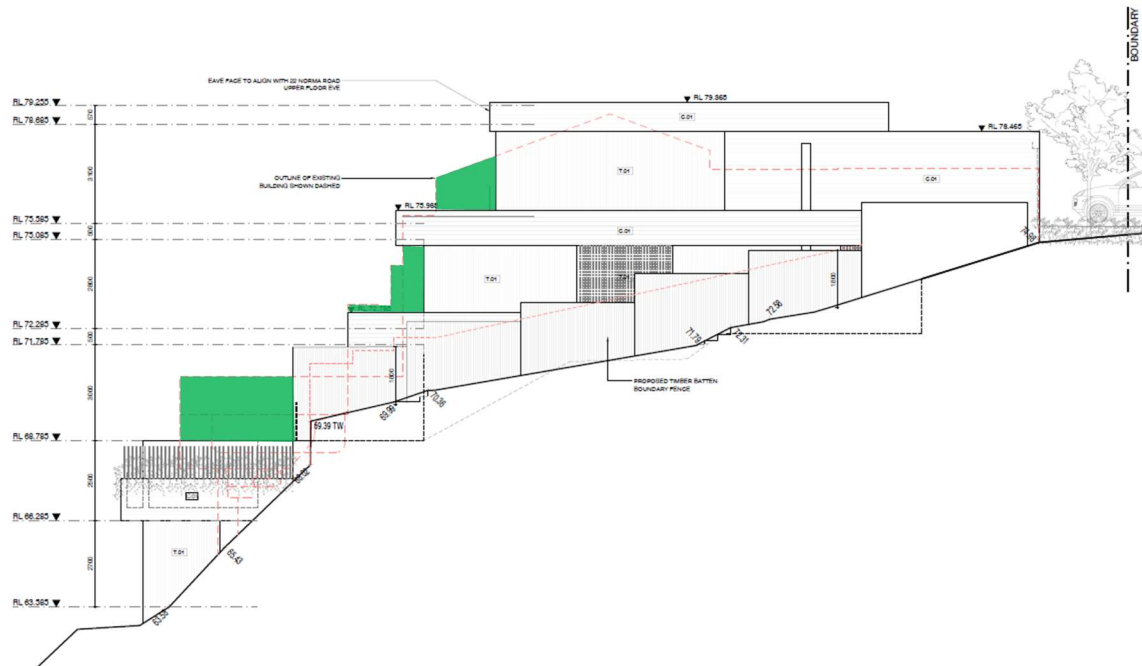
Extract of West Boundary Elevation with areas for view improvement shown in green
